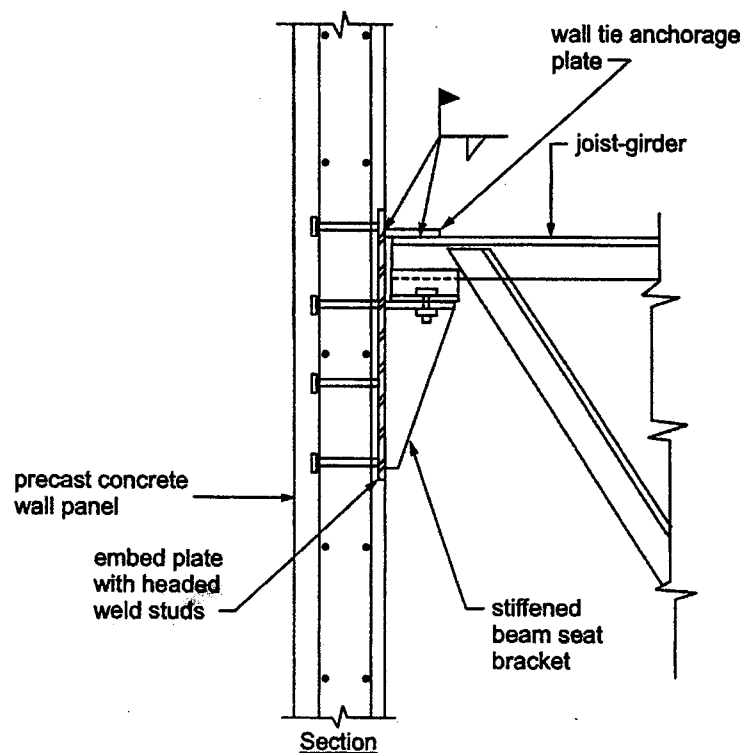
Bracket for wall-roof anchorage at joist-girder
